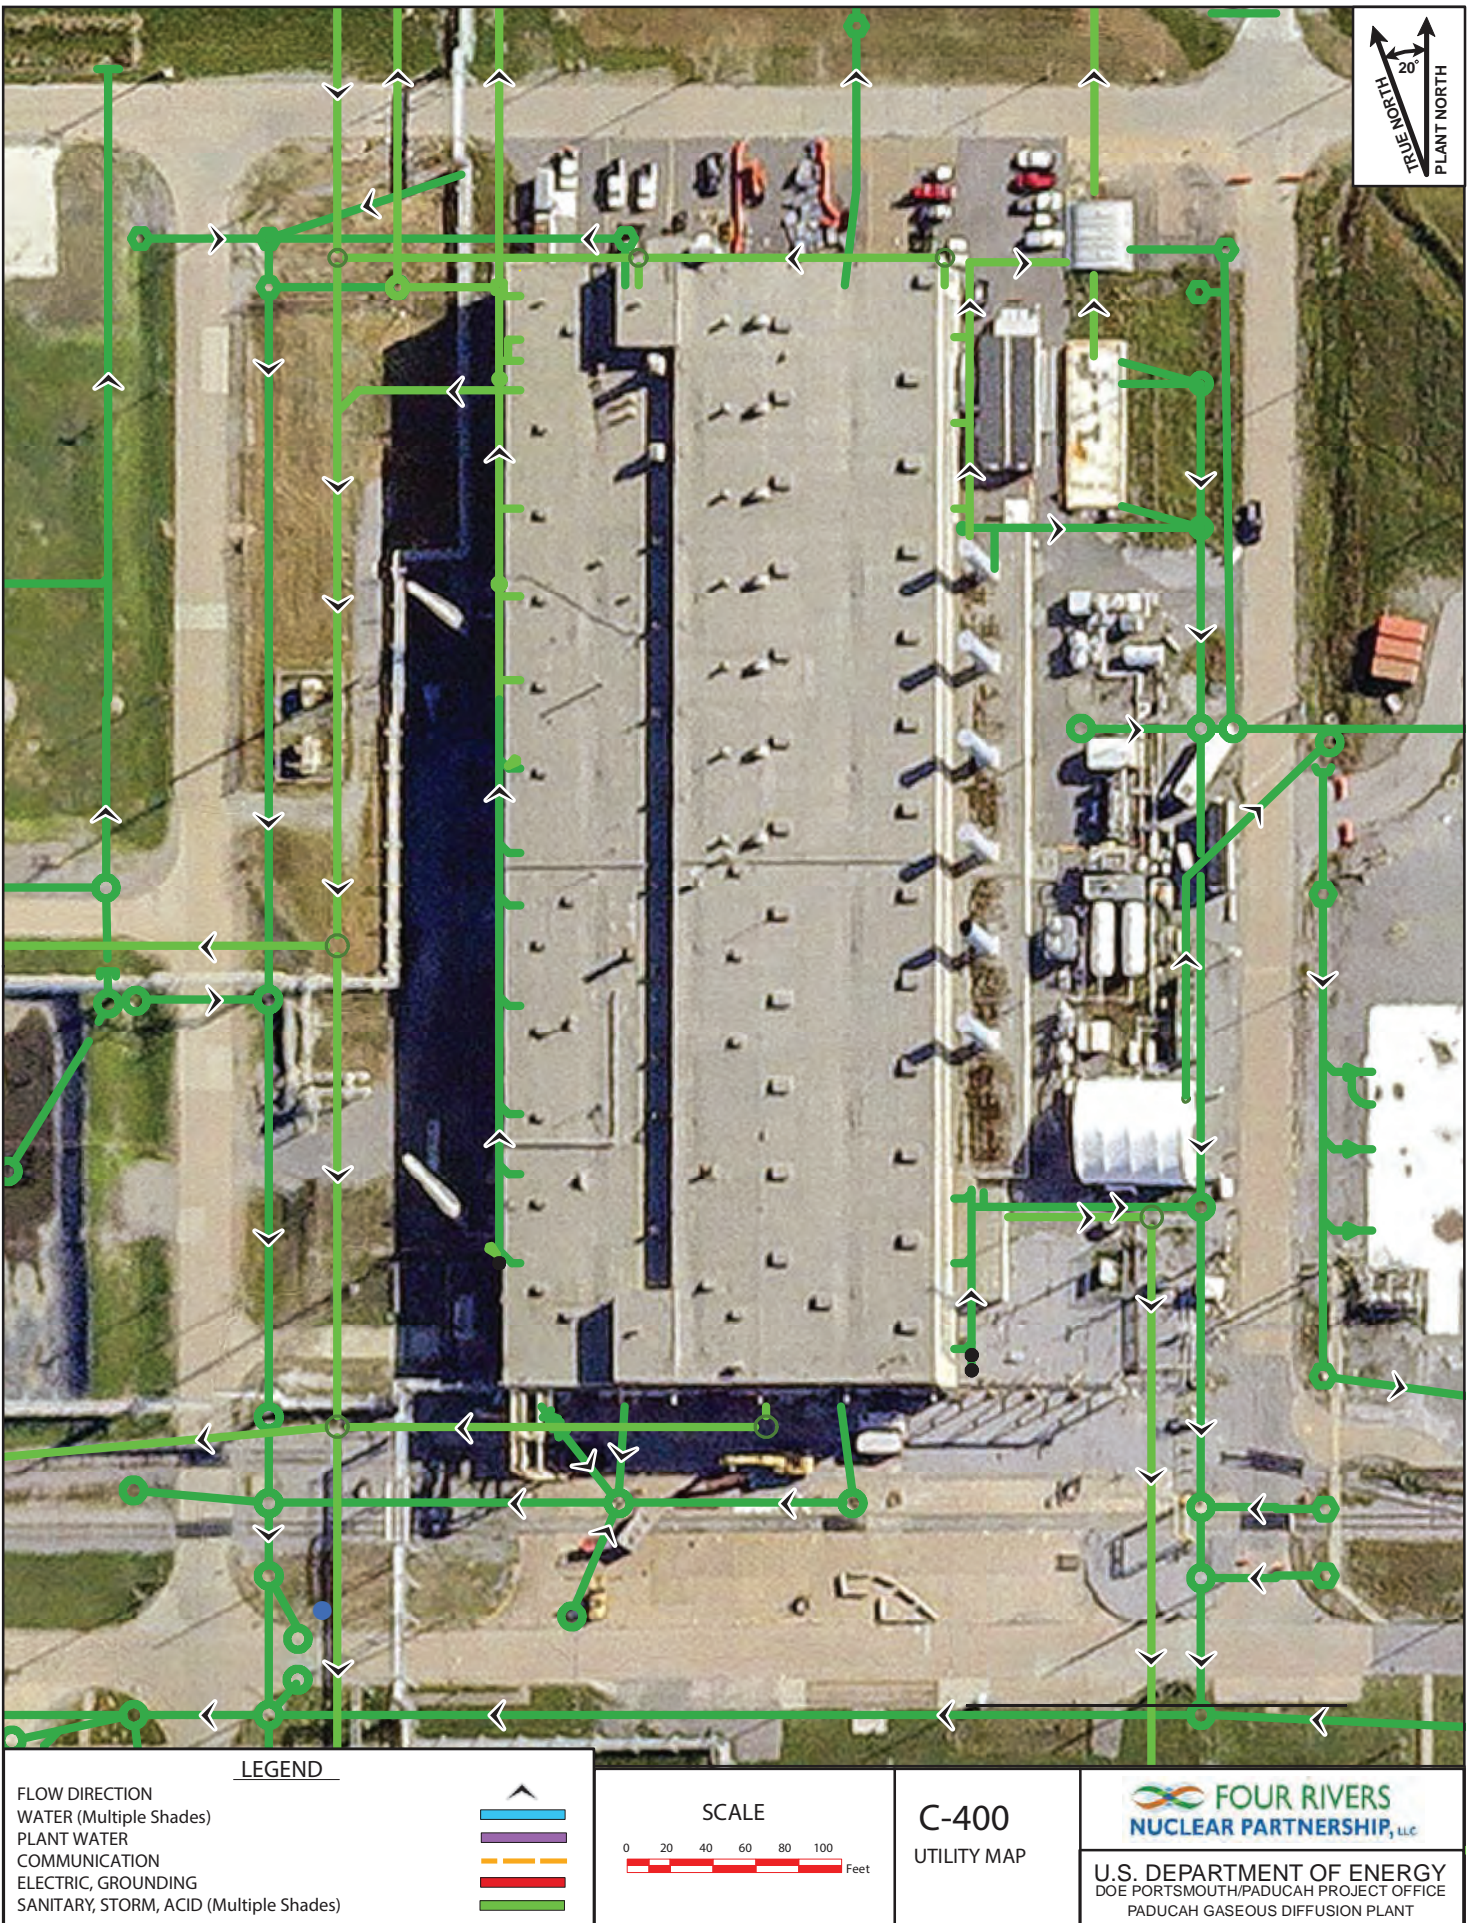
Underground Drain Lines within the C-400 Complex and Adjacent to the C-400 Cleaning Building
